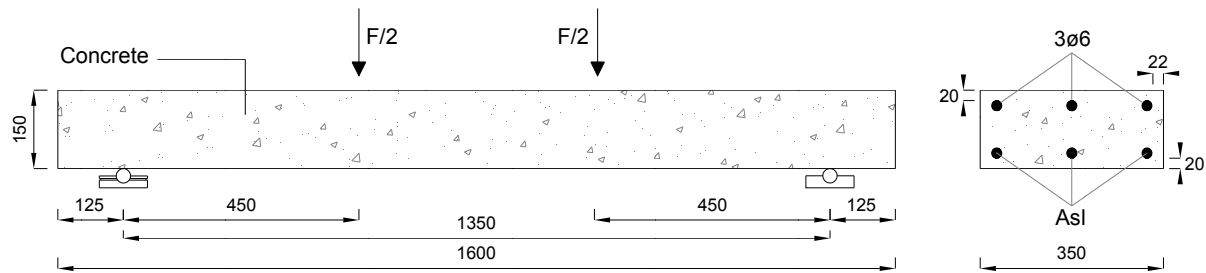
Geometry, support and load conditions of the tested shallow beams [mm].
